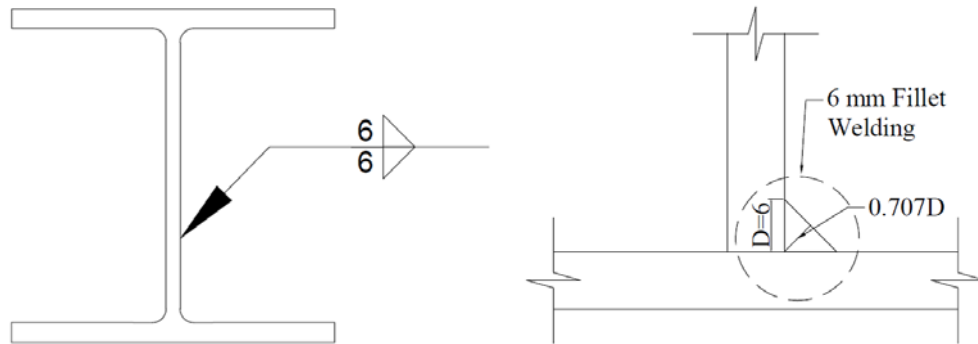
Details of Beam-Column Fillet Welding
